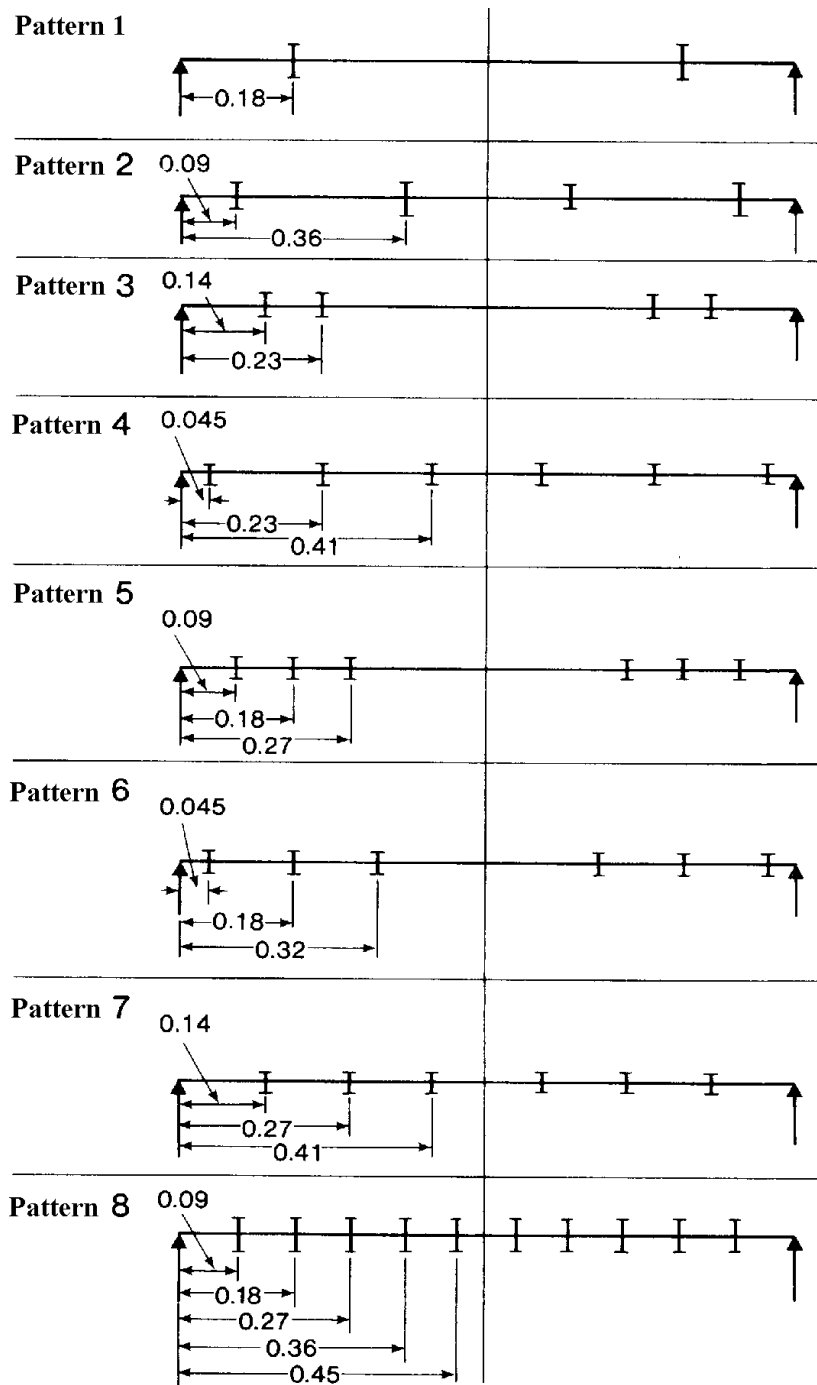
Eight patterns of bolting used in beam tests (Stimpson, 1983)
